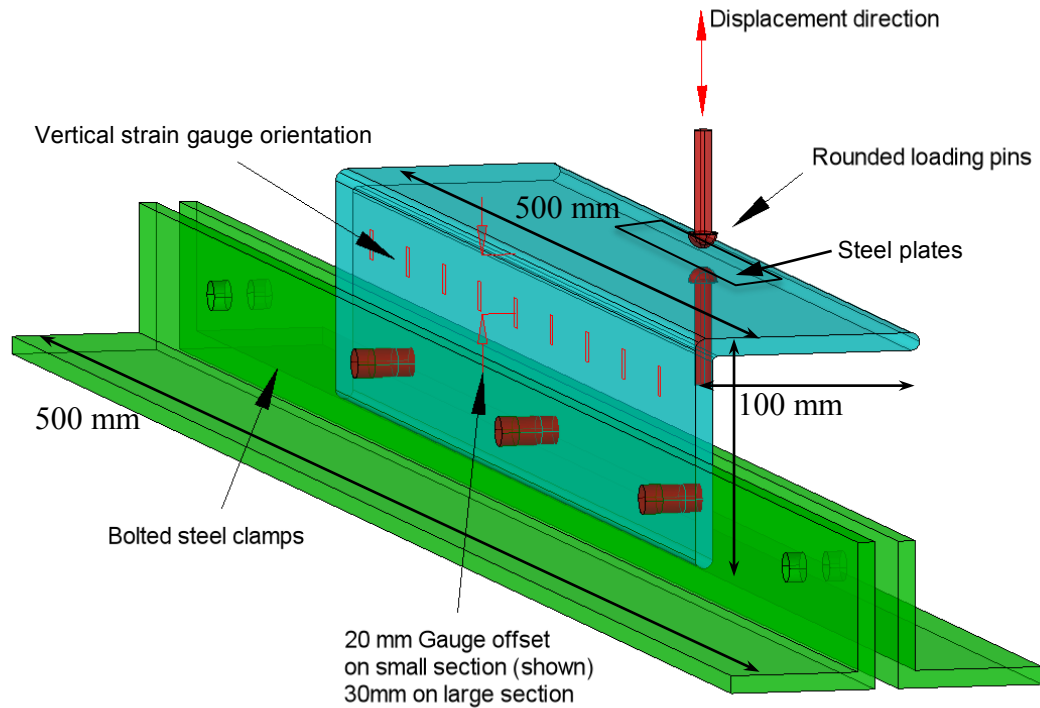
Schematic showing general arrangement of specimen bolted into rig, loading displacement direction and strain gauge orientation
